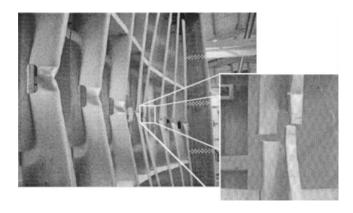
Wall W5 after test—studs developed full capacity signified by rupture of stud at middle section
